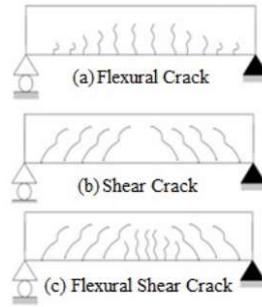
Cracks on reinforced concrete beams [6]
